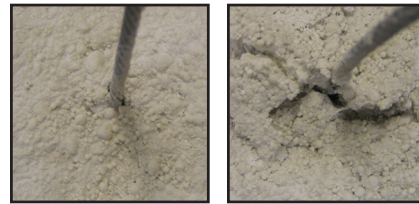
Concrete pullout test specimens before failure (left) and after failure (right).
